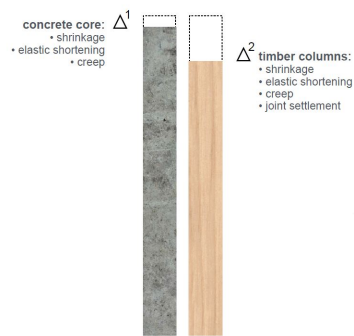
Differential shortening between concrete core and timber columns (Pilon et al., 2016).
